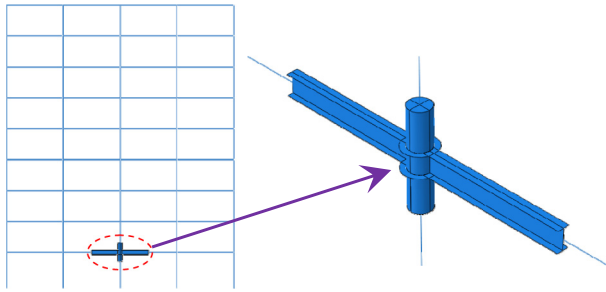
The multi-scale model for steel beam to CFST column connections.
